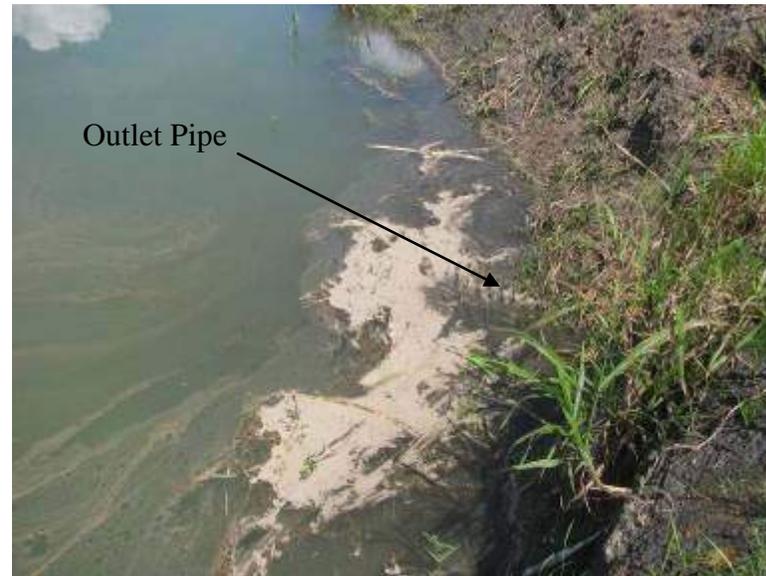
Upper East Pond – Divider embankment interior slope, 18-inch diameter corrugated HDPE outlet pipe, looking east. Pipe is submerged.
